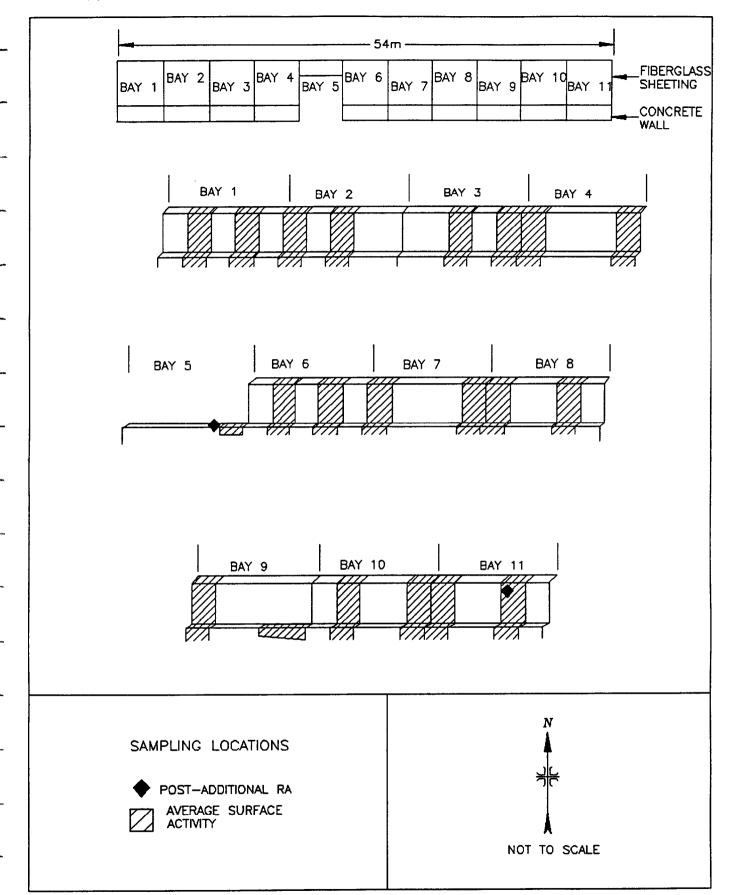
Building 3, West Wall — Measurement and Sampling Locations
